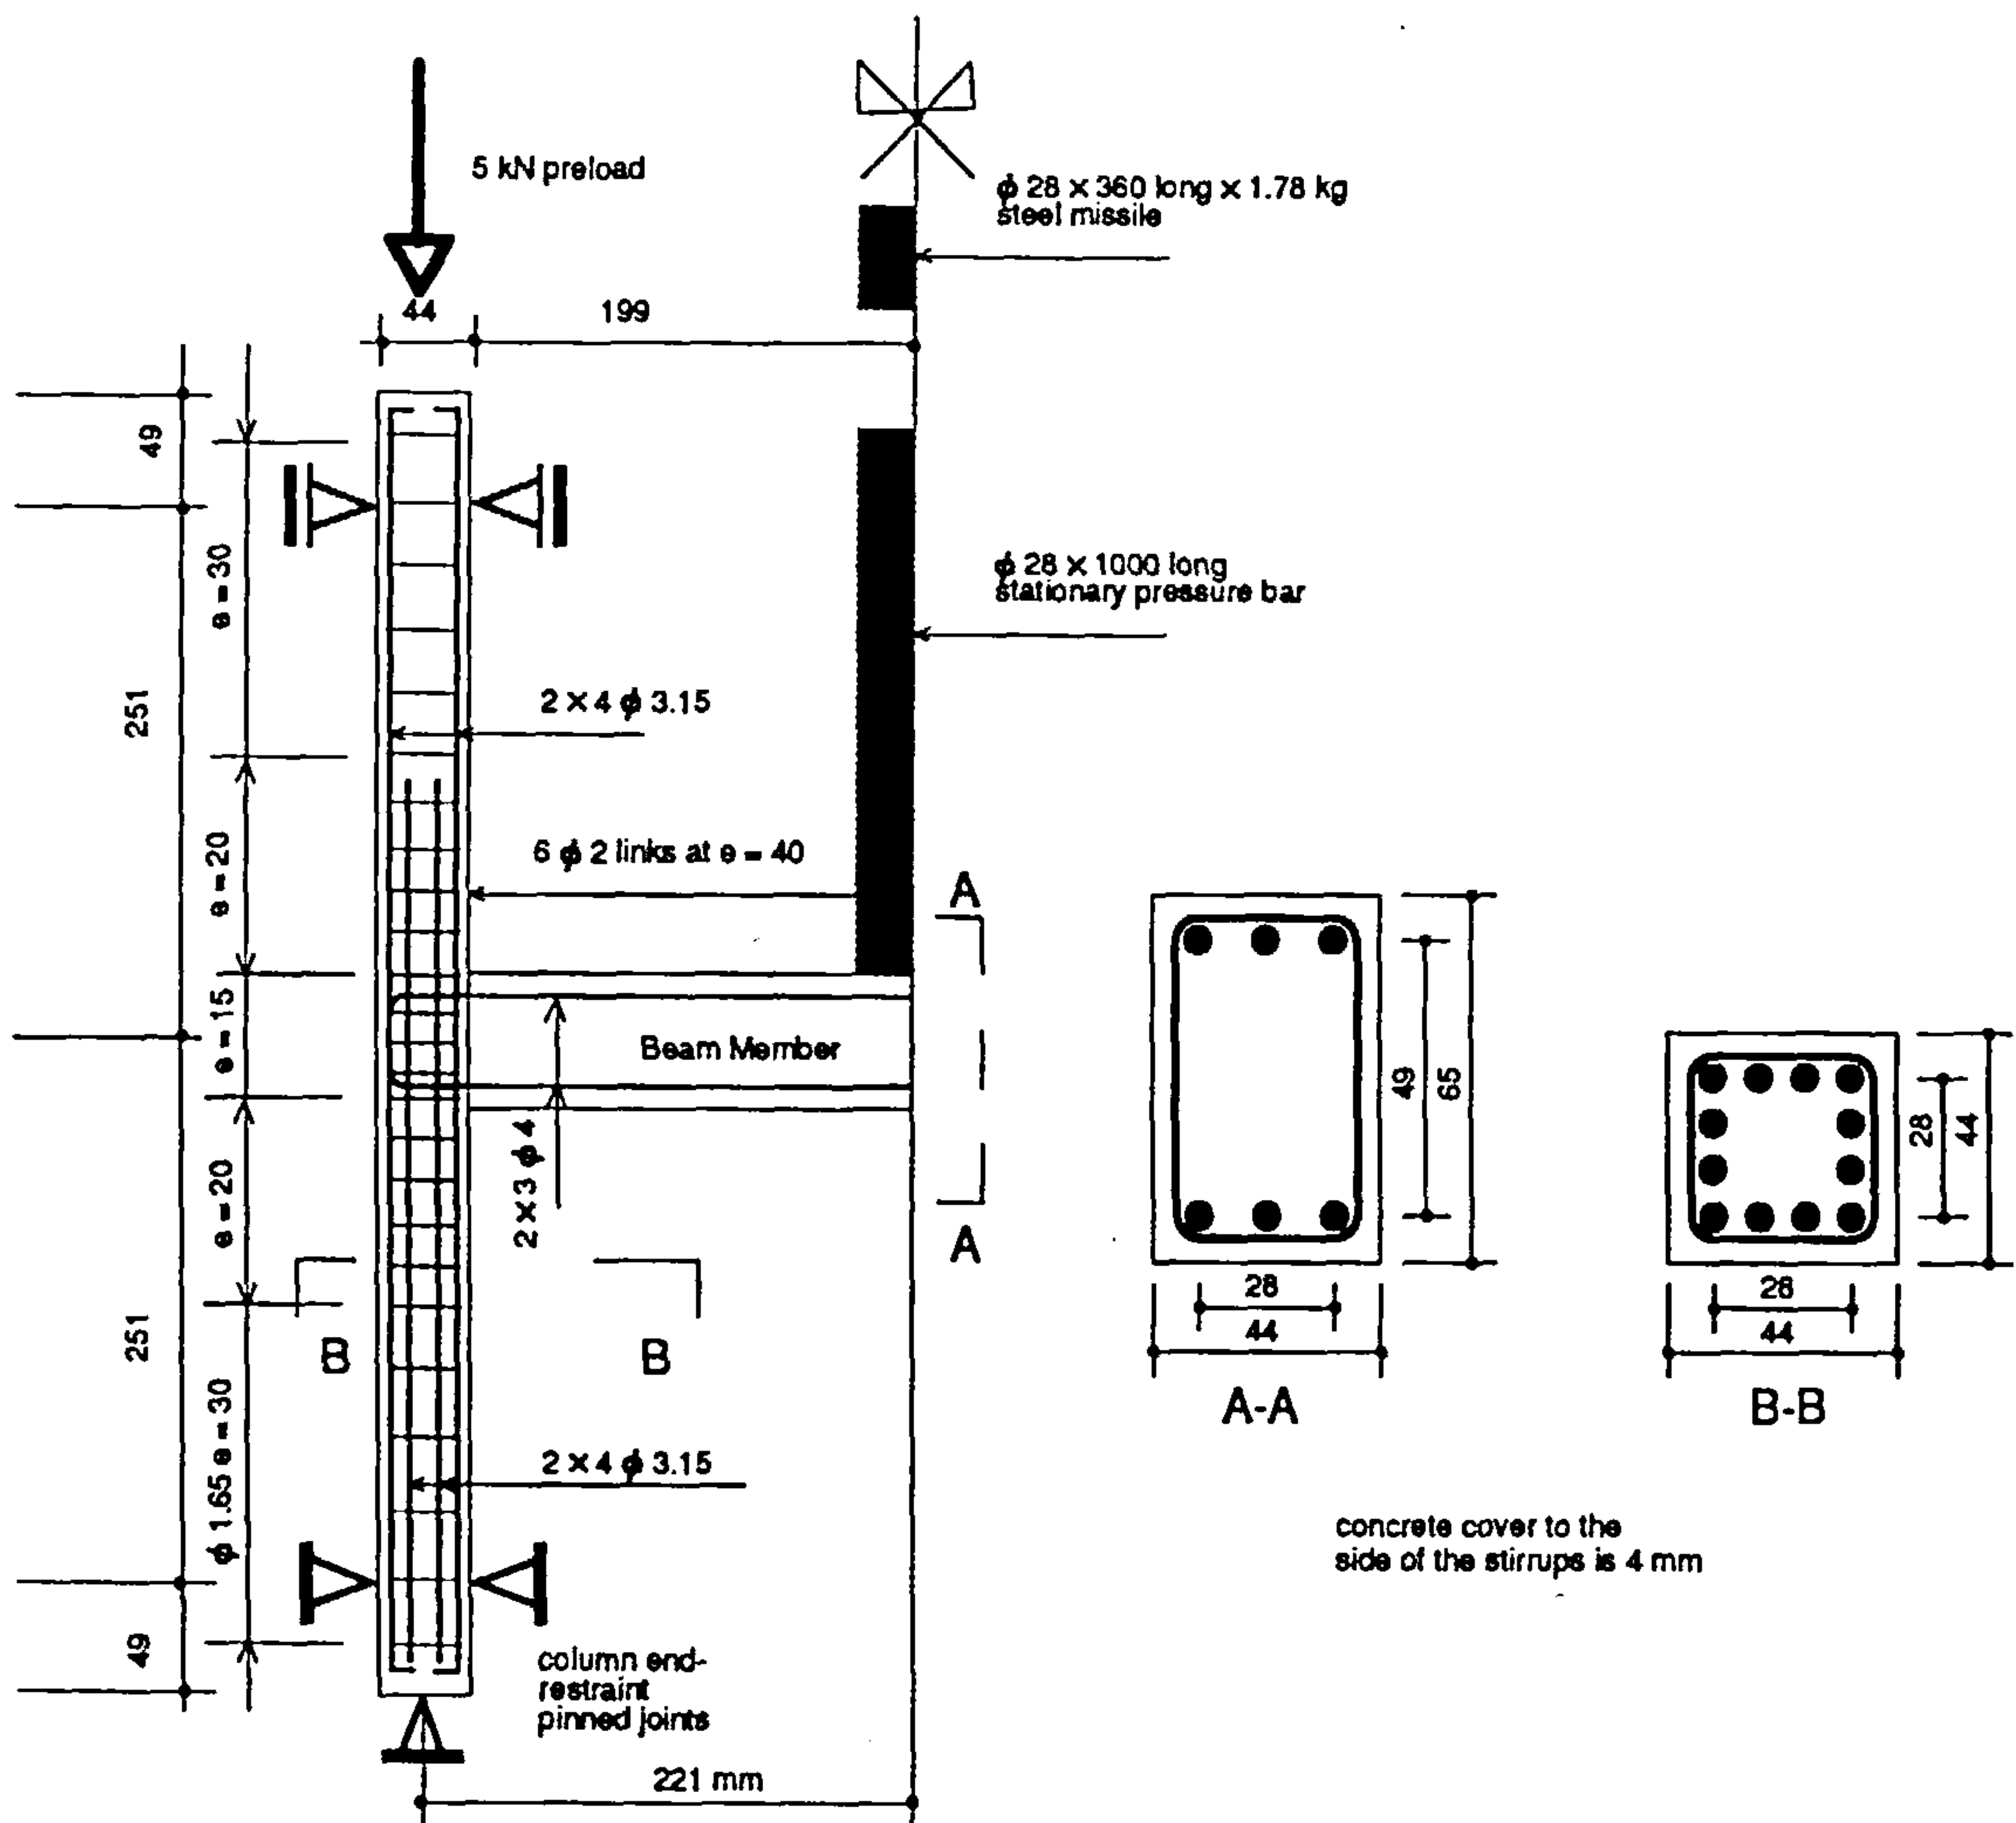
Dimensions, reinforcement and loading arrangement for the portal frame tested by Watson and Ang [150]
